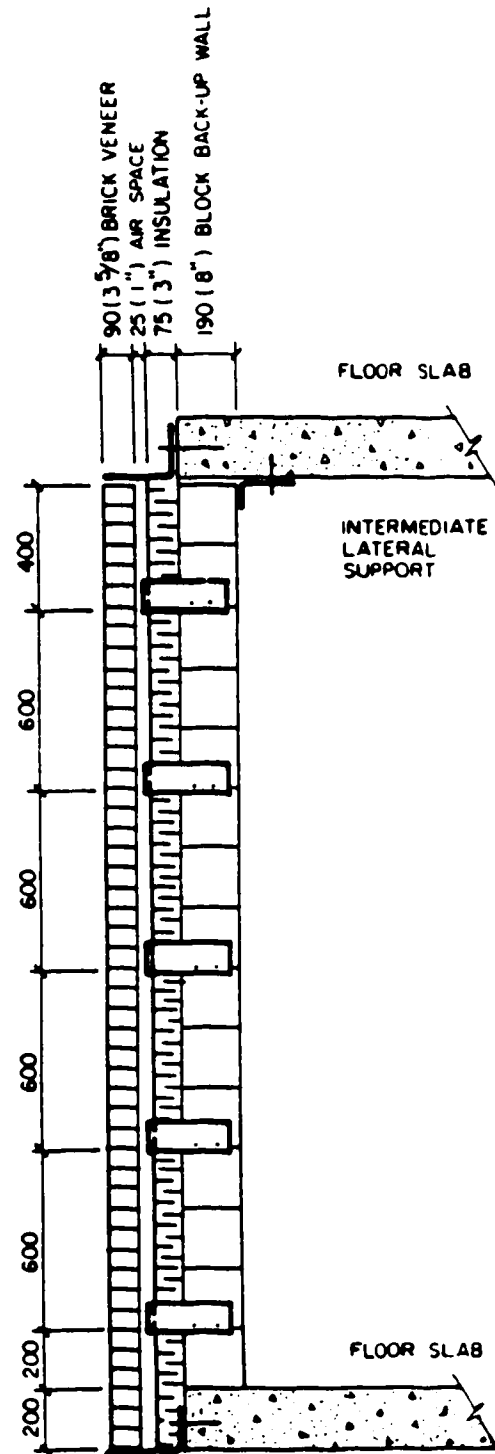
Cavity Wall System Utilizing Shear Connectors
